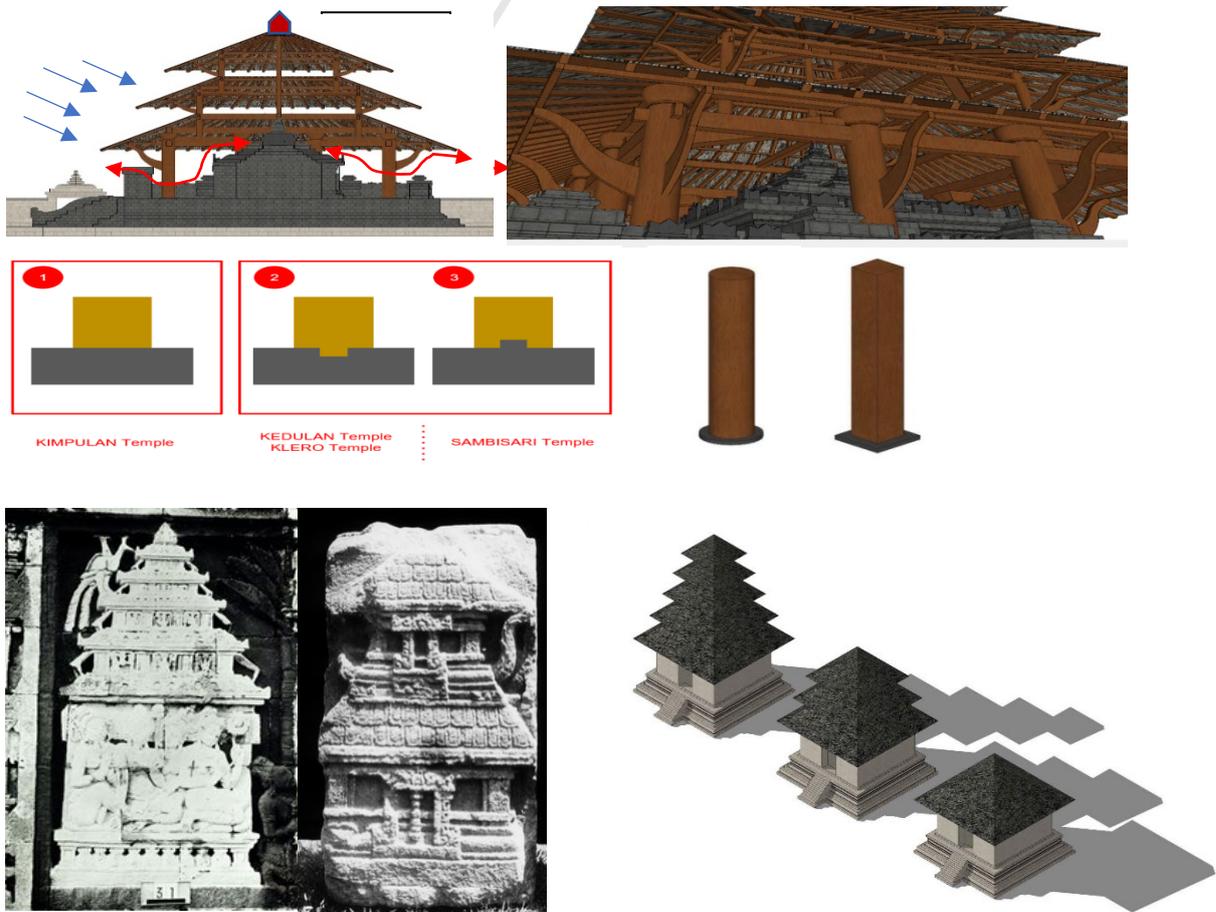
Upper : Ward off Rain Water, Cross Ventilation, Detail Wooden Construction; Below Column and Foundation (*umpak*) [24]
